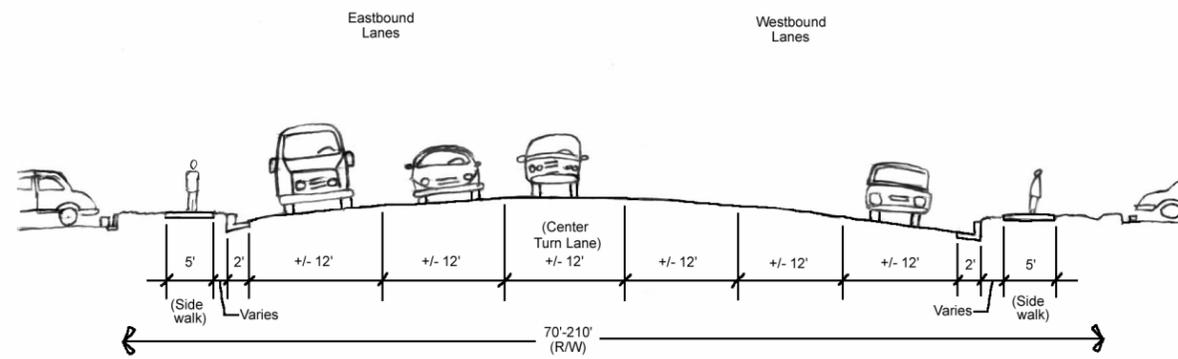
Sketch of Proposed Conditions along Windy Ridge Parkway (westbound)
